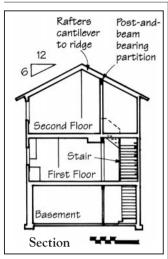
An off-center post-and-beam wall helps support the roof, leaving both the centerline and the floor plan open.
